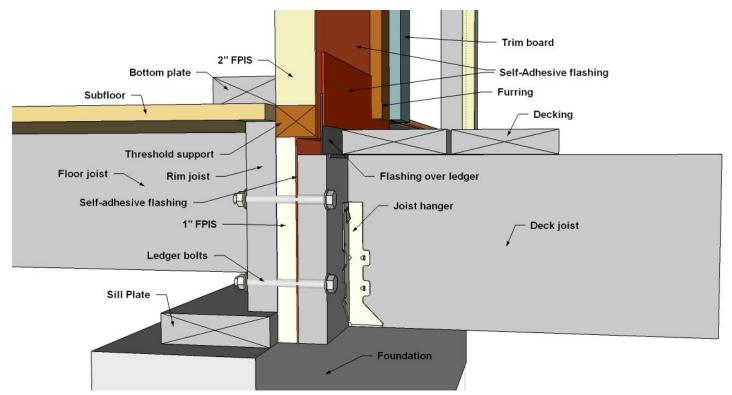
Deck Ledger – 2" FPIS Wall Sheathing, 1" FPIS behind Ledger at Rim<sup>xxi</sup>
